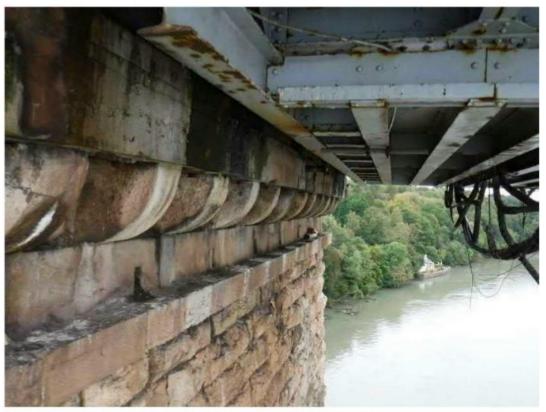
secondary deck – typical paint loss and corrosion to south end of main span (bearings obscured behind southernmost transverse beam)
